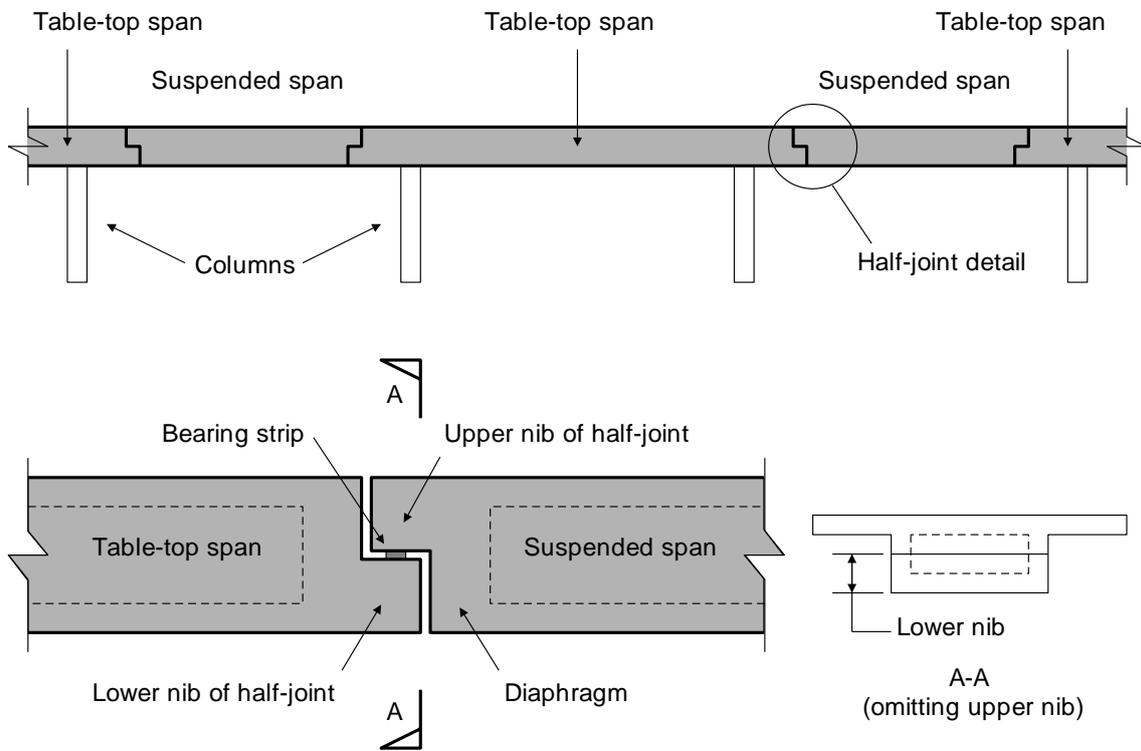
Schematic half-joint geometry for Kingston bridge approach ramps
